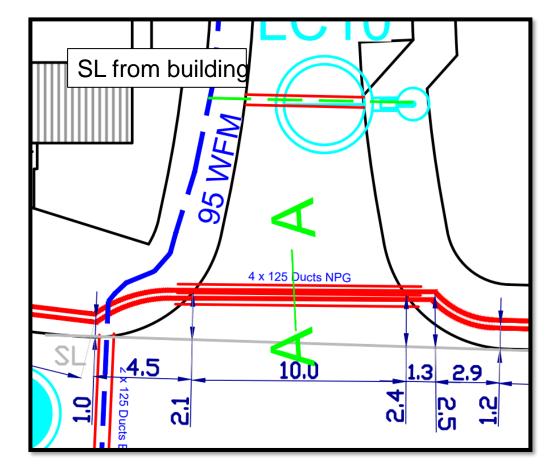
Dimensions to start/end of ducts and cable points taken from an additional sight line in order to make this acceptable.
